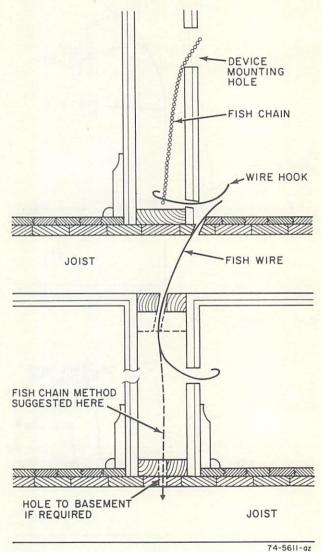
Fishing Wire From Second Floor Wall Through First Floor Wall.
